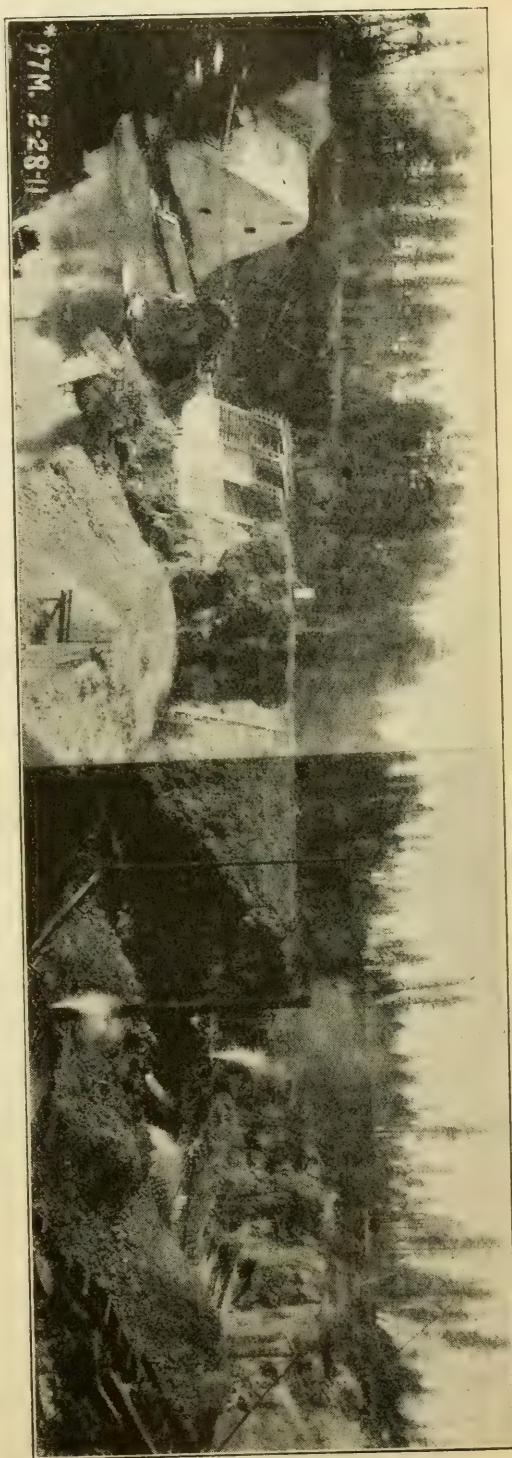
GENERAL VIEW, LOOKING DOWN STREAM. ISLAND CUT TO SLOPE OF DAM.
